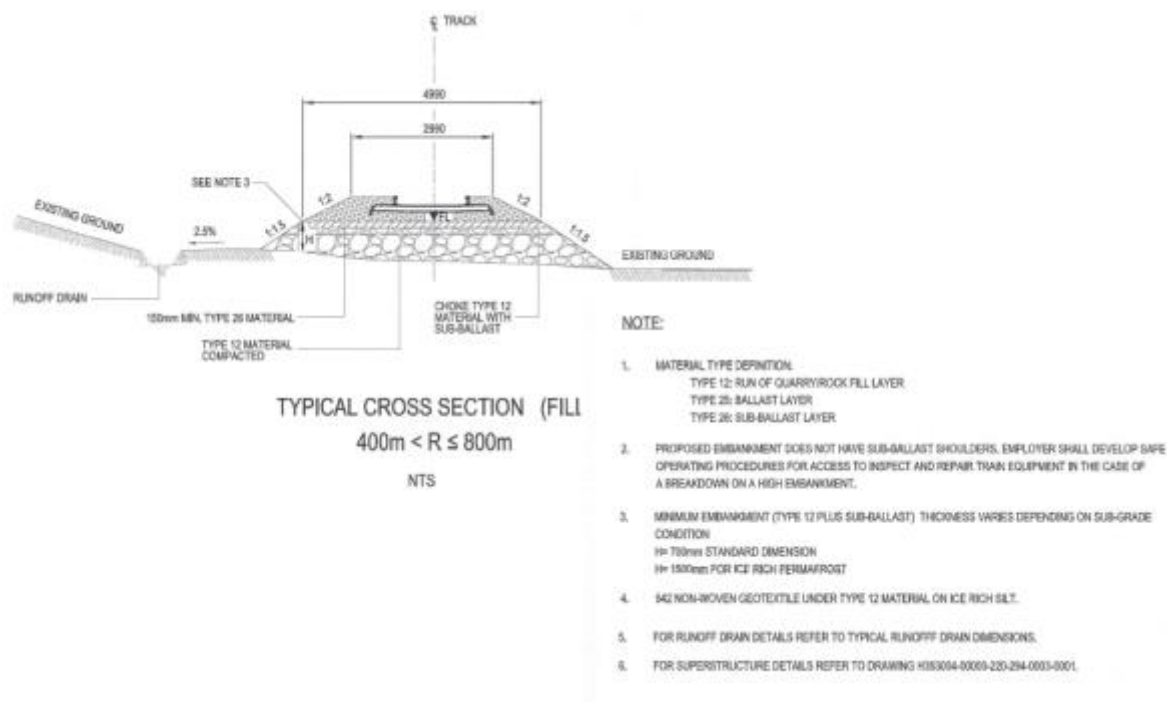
Typical Cross Section Railway Embankment on Soil – Section III
